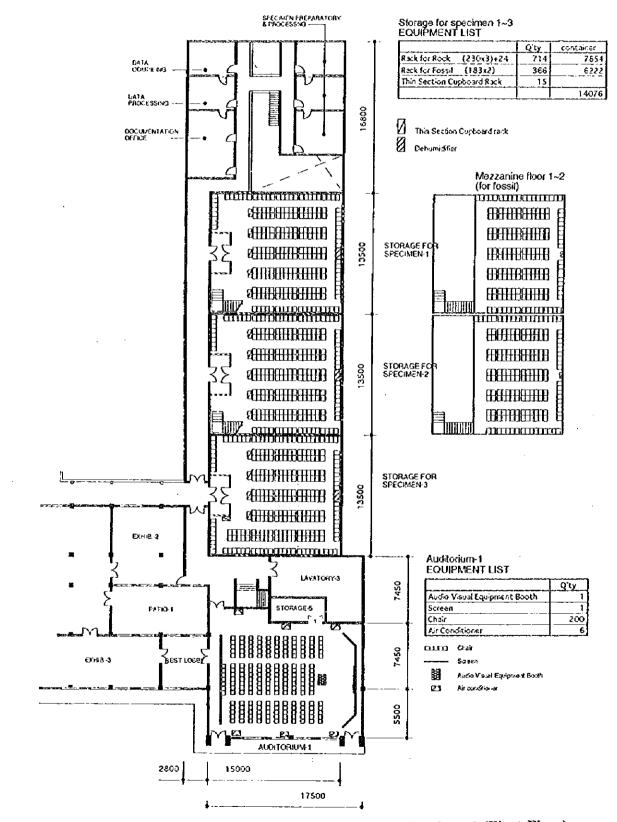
Storage for Specimen 1 - 3 and Auditorium-1 (First Floor)
